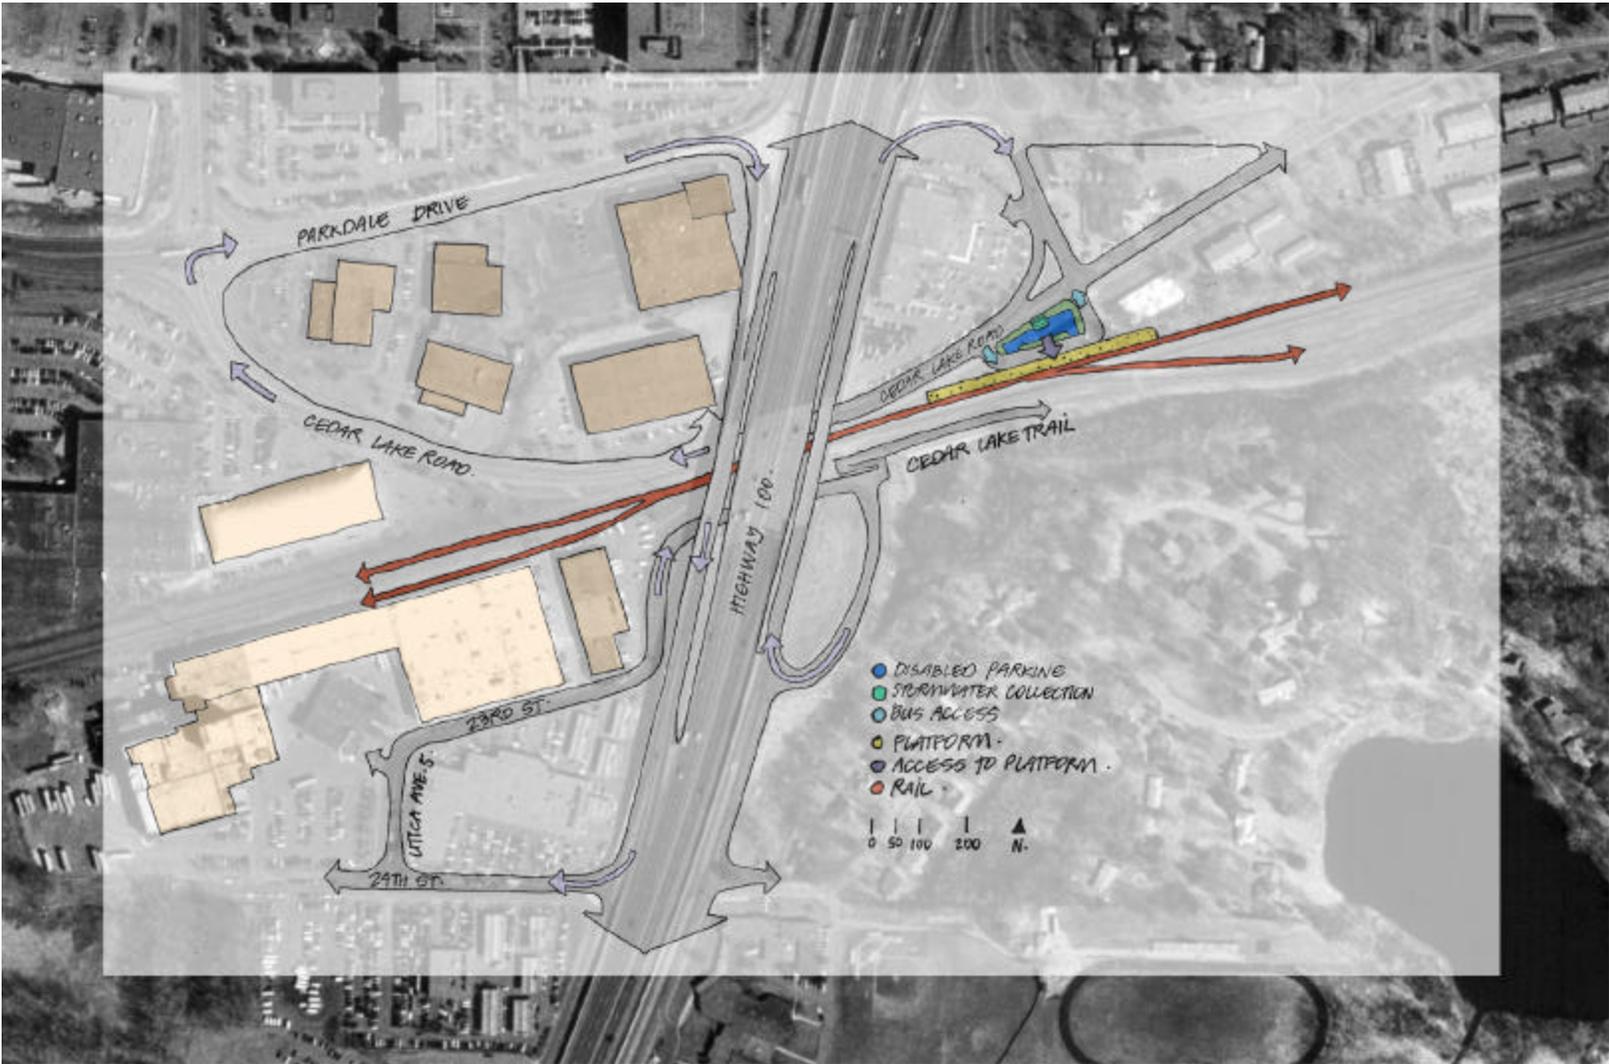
St. Louis Park North Platform Plan/Elevation
